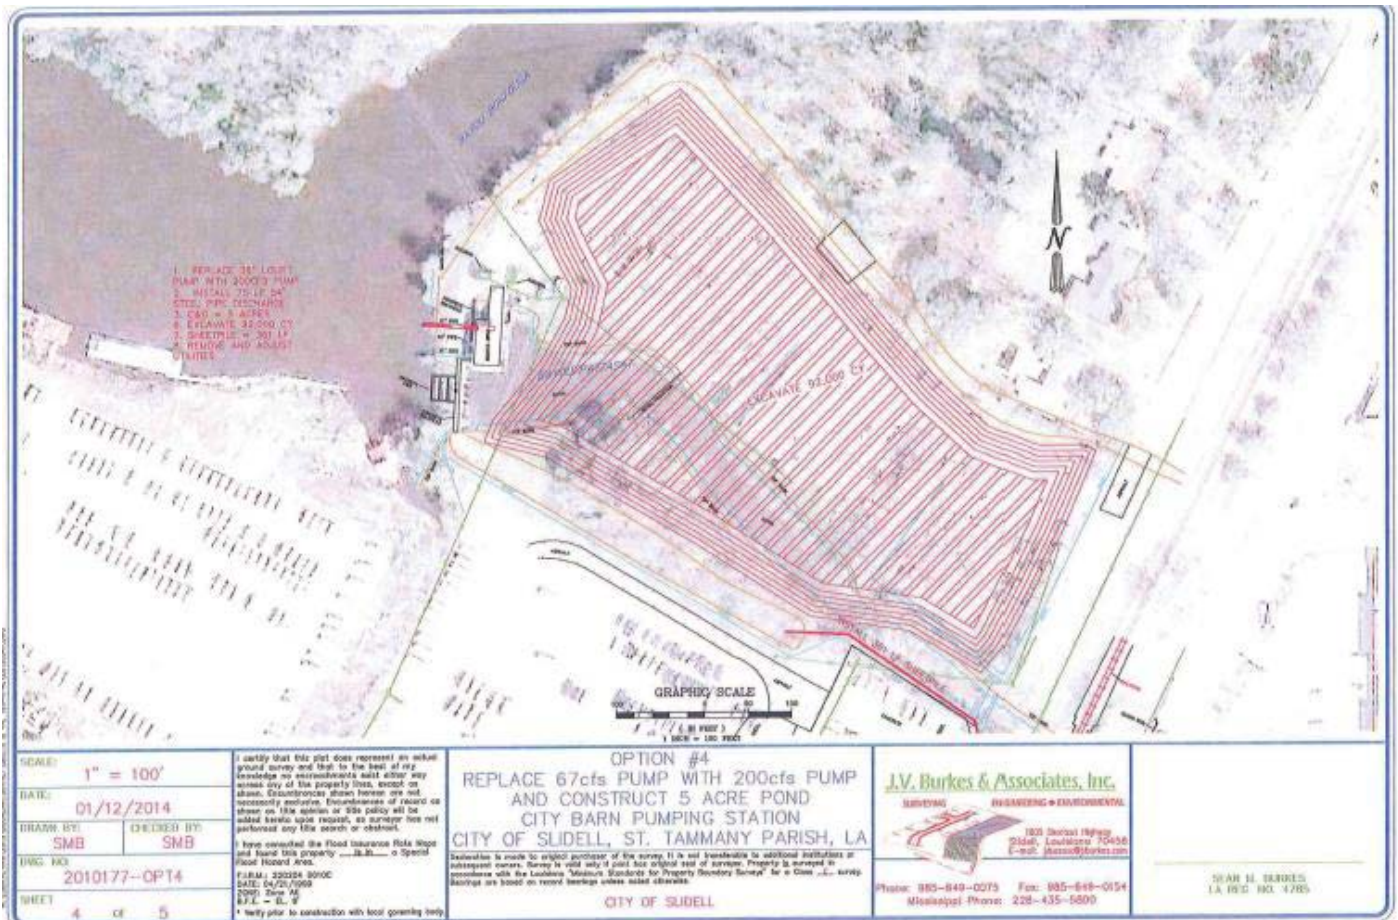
Proposed Site Layout of the Considered Alternative Exhibiting Placement of Outfall Pipe, 200 cfs Pump, Sheet Pile, Excavation area for Five (5) Acre Basin.
